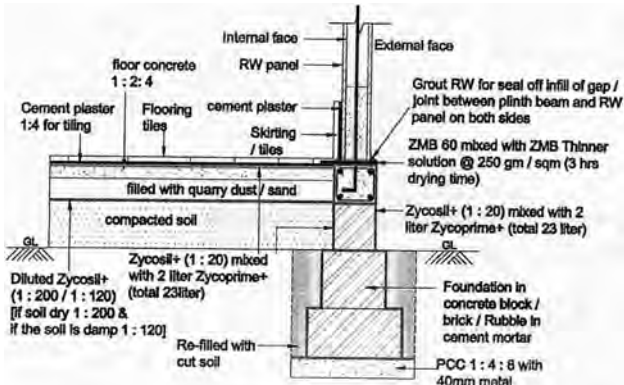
Foundation, basement, plinth beam and start-up for erection of Rapidwall panels
